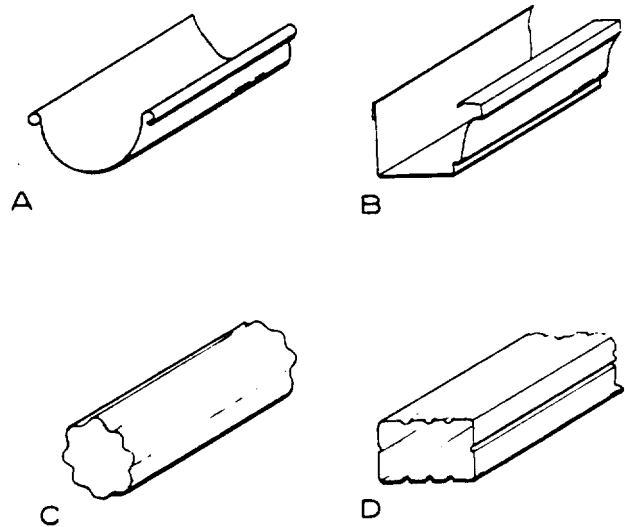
Gutters and downspouts: A. Half-round gutter; B. Formed gutter; C. Round downspout; D. Rectangular downspout.
